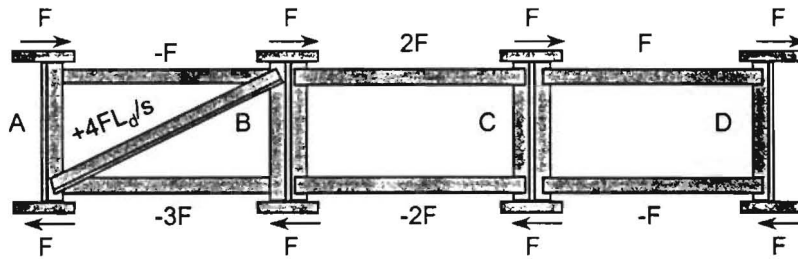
Proposed Cross-frame Layout to Minimize Fatigue Damage
